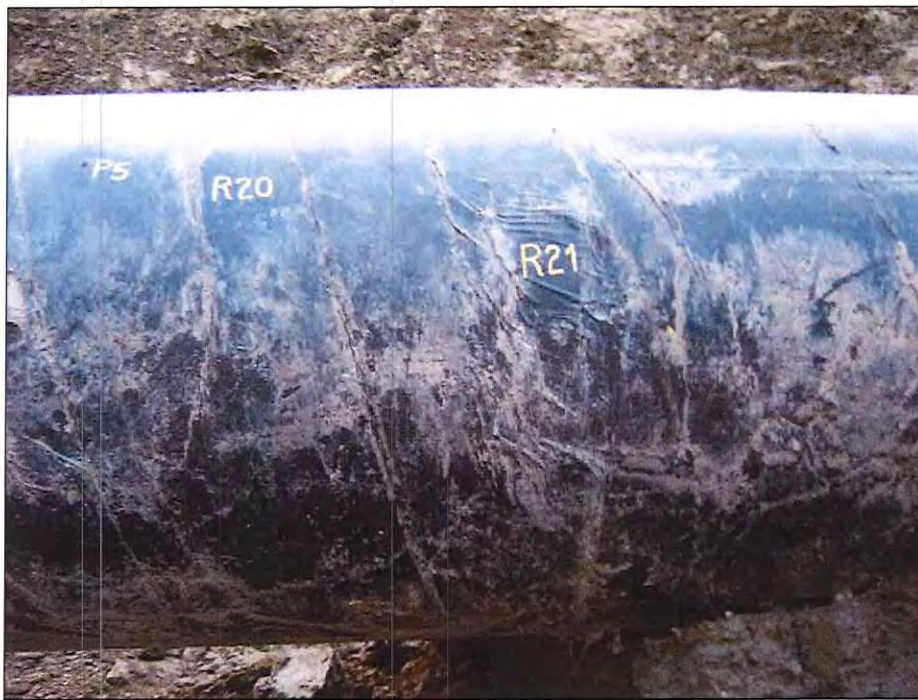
• Site 2. Disbonded Coating at Longitudinal Weld. Looking South – 04.
